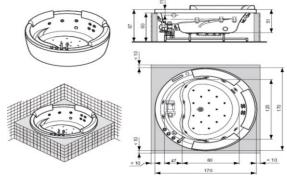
SHOWS JACUZZI TUB DIMENSIONS .
